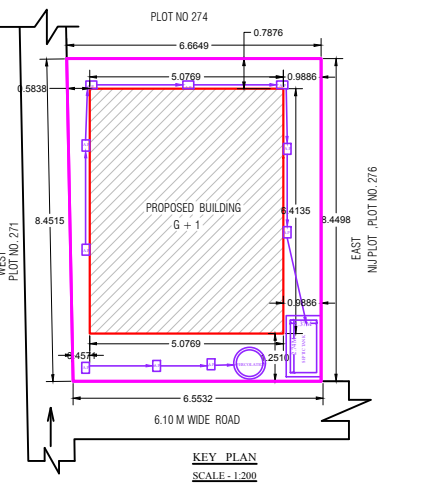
DETAILS OF GROUND WATER RECHARGING PIT WITH SILT TANK
